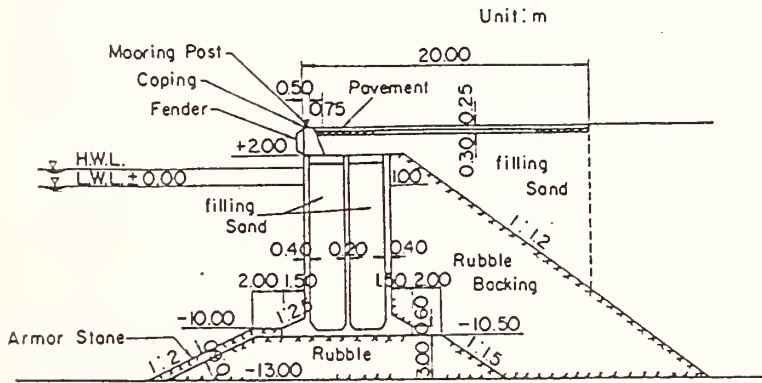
Standard Section of Caisson Type Quaywall (Murata et al.6)
